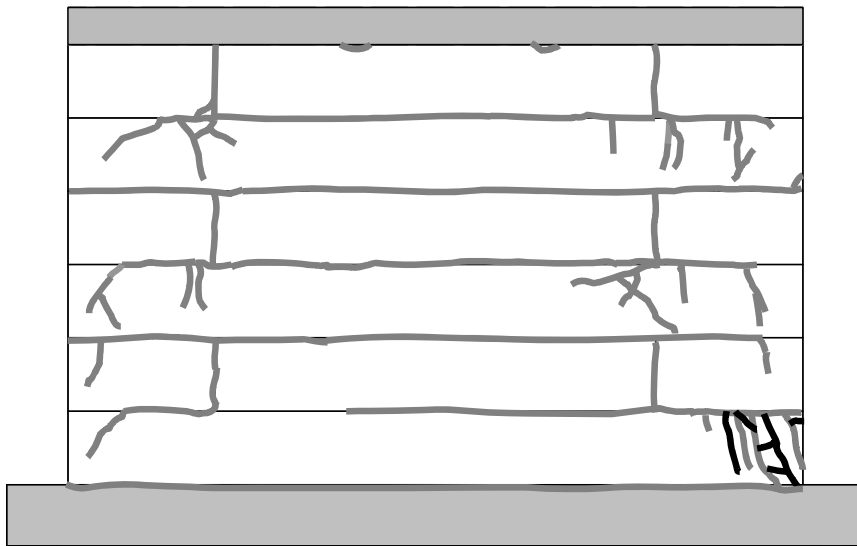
Cracking of Shear Wall Pilot Specimen 1 at end of test (crushing of AAC in lower south corner)
